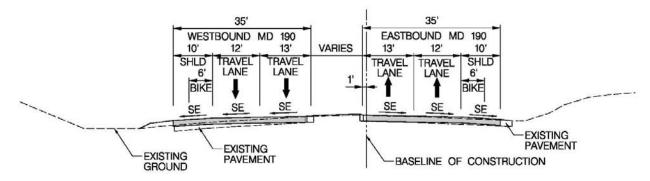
Alternative 1 – MD 190 East and West of Intersection with Pyle Road
